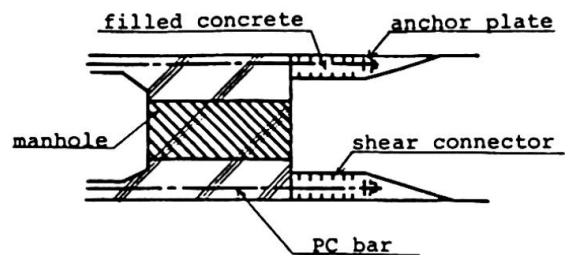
Details of joint in Iguchibashi Bridge, Honshu-Shikoku Bridge Authority
